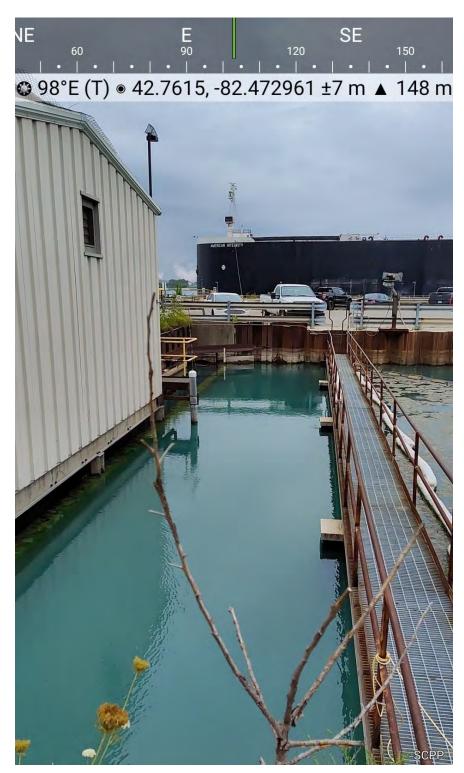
West Basin Box Culvert Opening from East Side of West Basin Looking South
